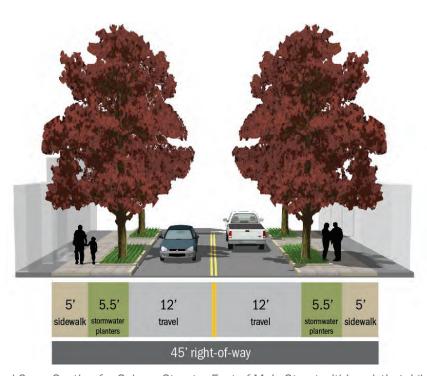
Conceptual Cross-Section for Ochoco Street – East of Main Street within existing right-of-way (looking east)
